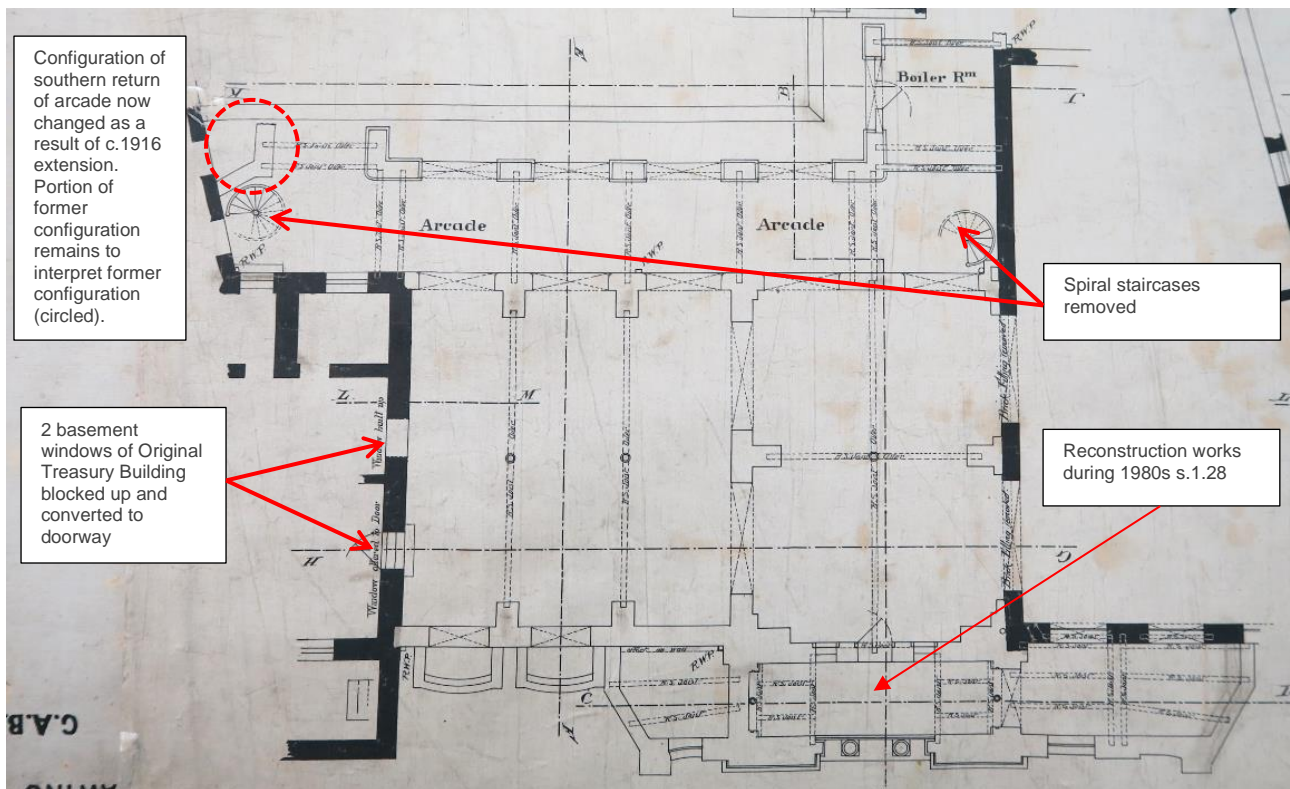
Basement Floor Plan, by Vernon, December 1897
